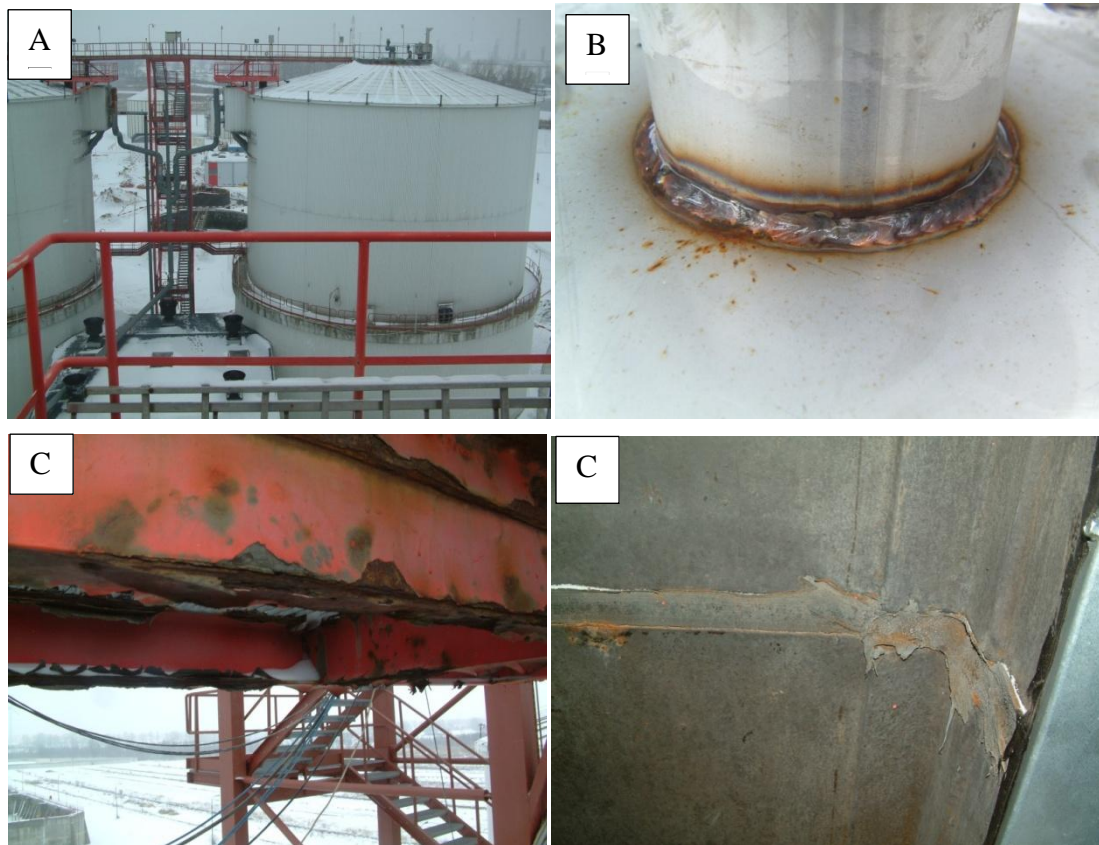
(a) Fermentation tank, (B) View of weld cracking, (C) Corrosion damage to external parts of the installation
